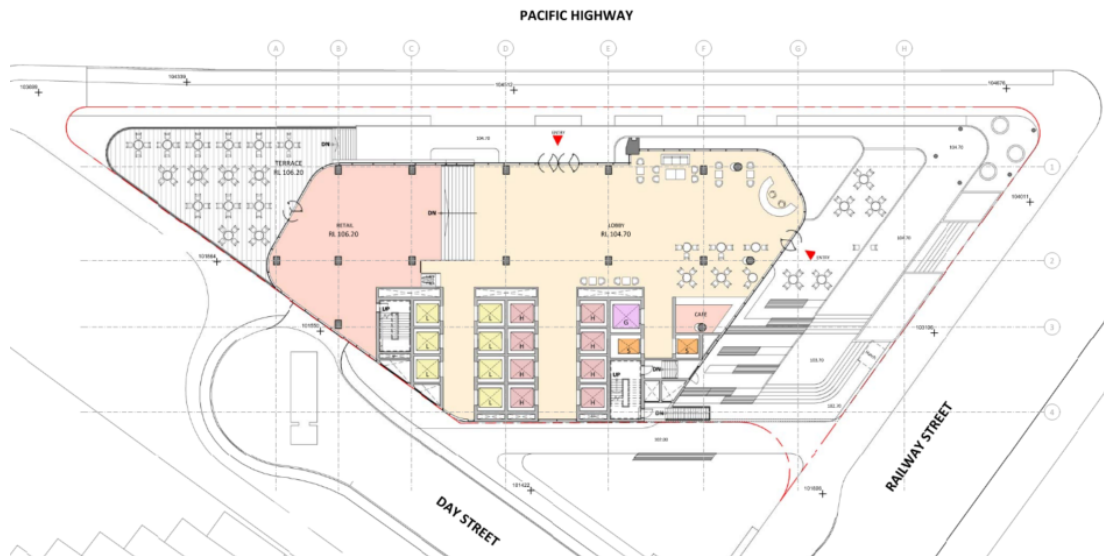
845 Pacific Highway – Conceptual ground plan (PTW)
